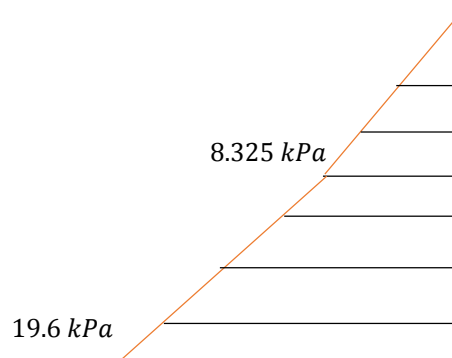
Vertical Earth Pressures using for calculating lateral earth pressures acting on the Gabion Retaining Wall
